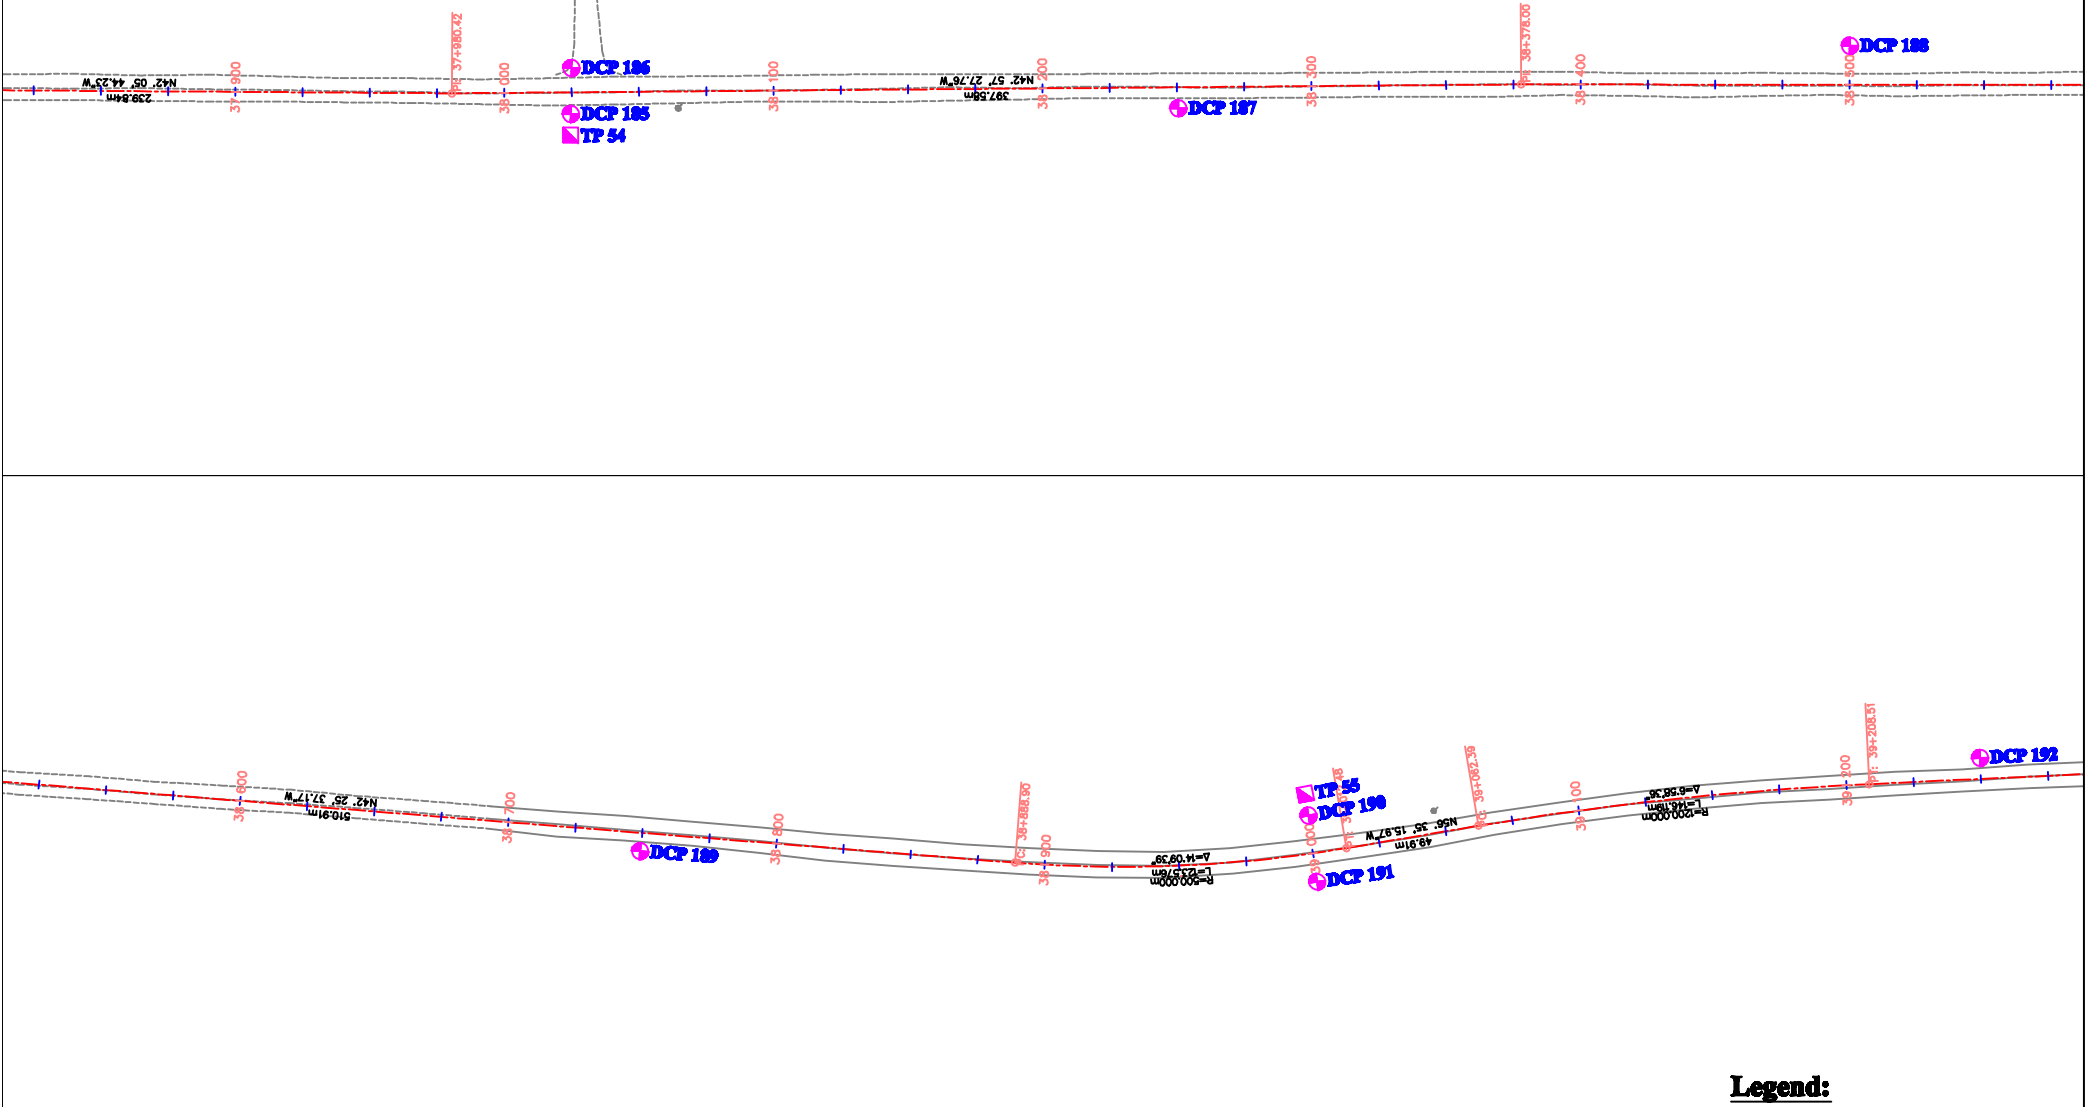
Location Plan of Test Pit Log and DCP Test
